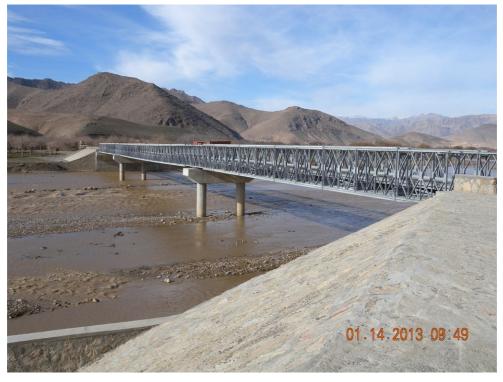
View of Regak Bridge from right side, facing toward Abutment #A1
